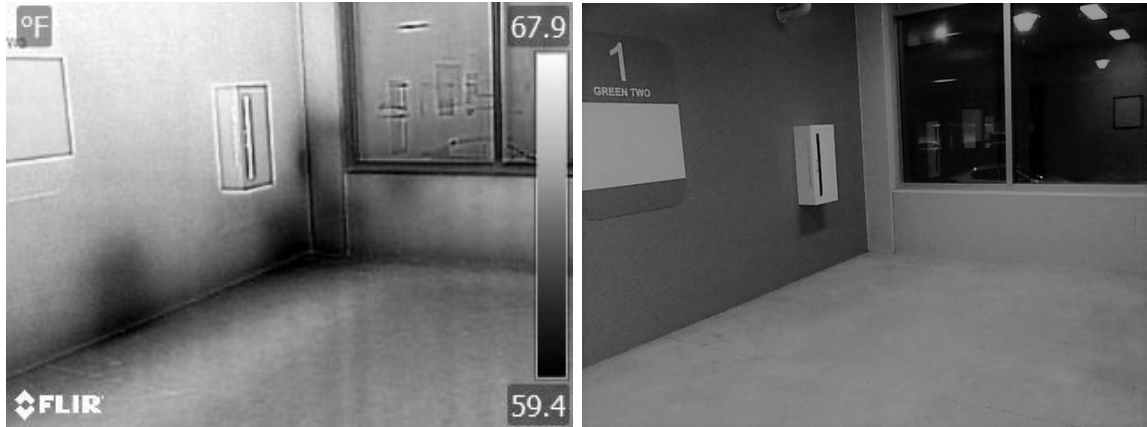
Heat transfer through thermal bridge at base of wall (interior of Figure 2-4 stairwell)
